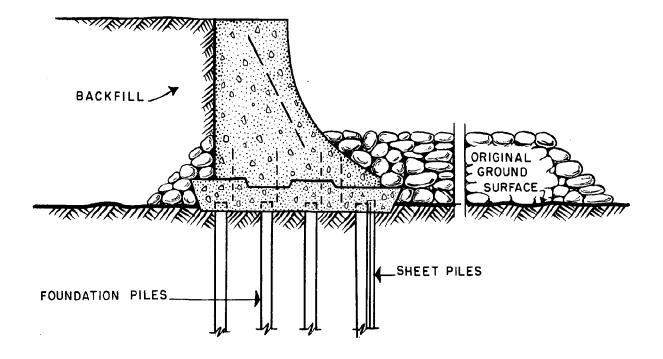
Typical Concrete Curved-Face Seawall
